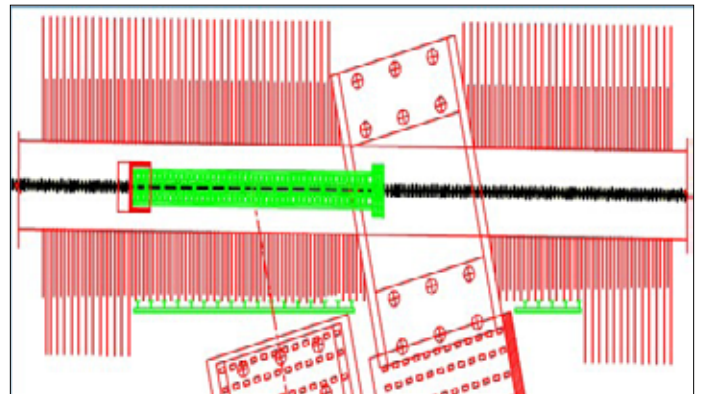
Schematic Plan Showing Shift in Position of RH Girder to Align with LHS Box
